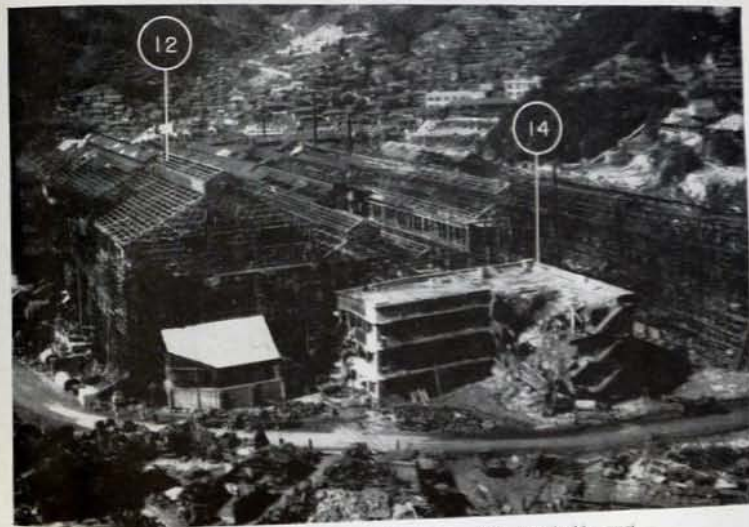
Group 52, Buildings 12 and 14. Aerial view looking west.
